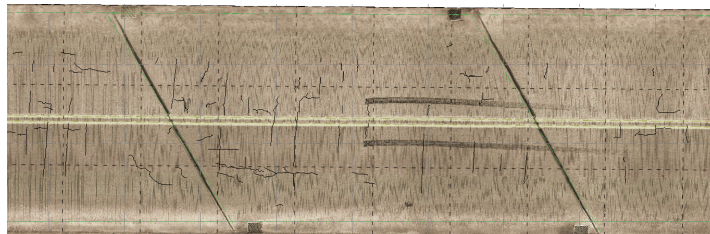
Existing Cracks of Bridge Deck No. 22383-Span 2
